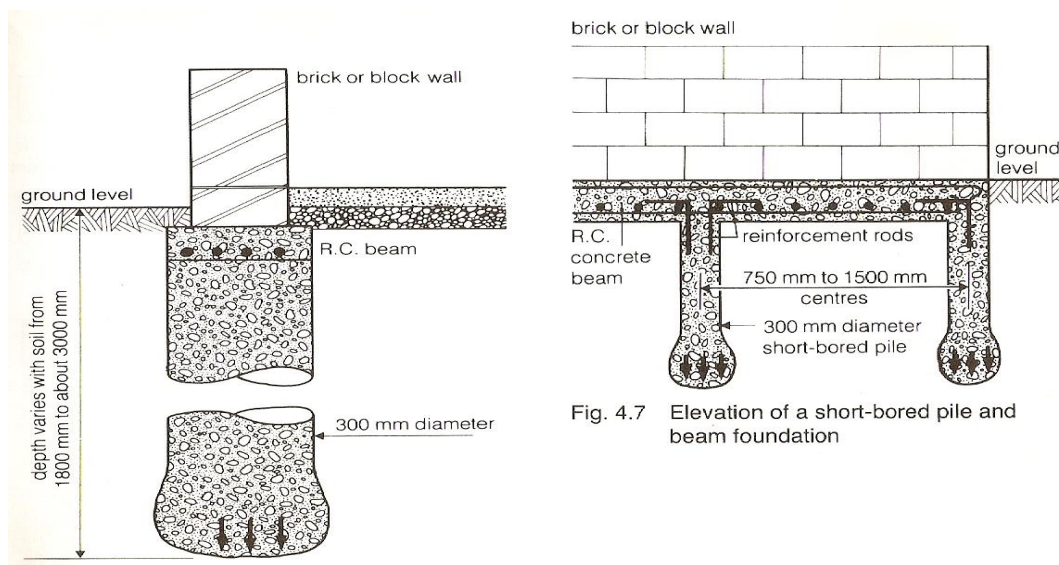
Elevation of a short-bored pile and beam foundation
